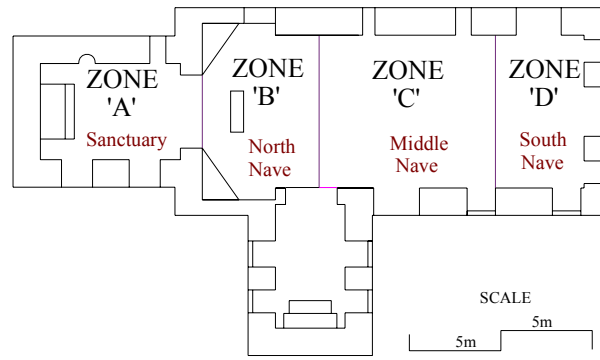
Ground Floor plan with the zones demarcation (Floor plan courtesy: Engr.Thomas D’Costa)
